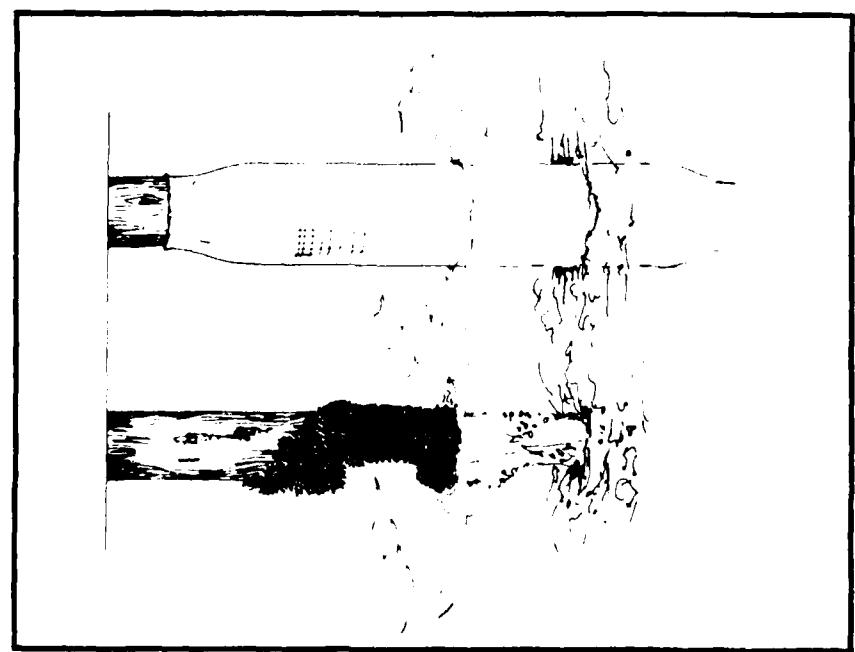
Sketch of typical damaged pile and fiberglass form (U.S. Naval Facilities Engineering Command, 1975).
